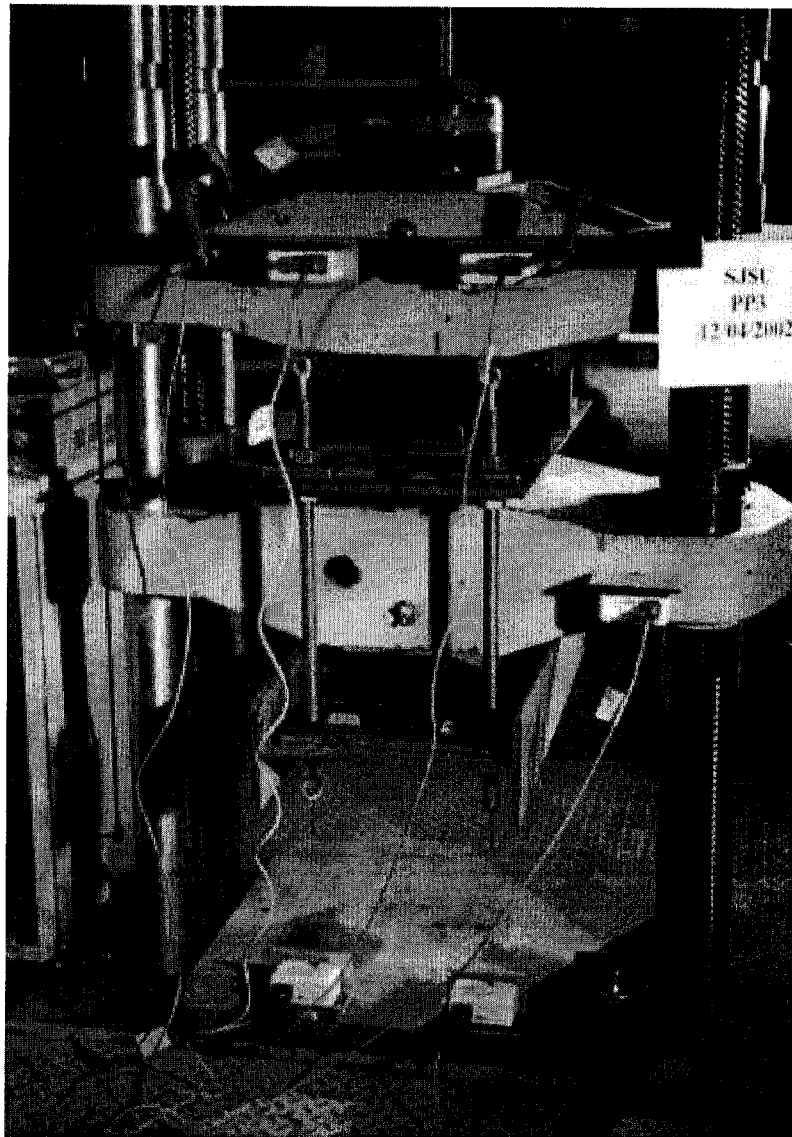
Cantilever Tests Instrumentation Lay Out
